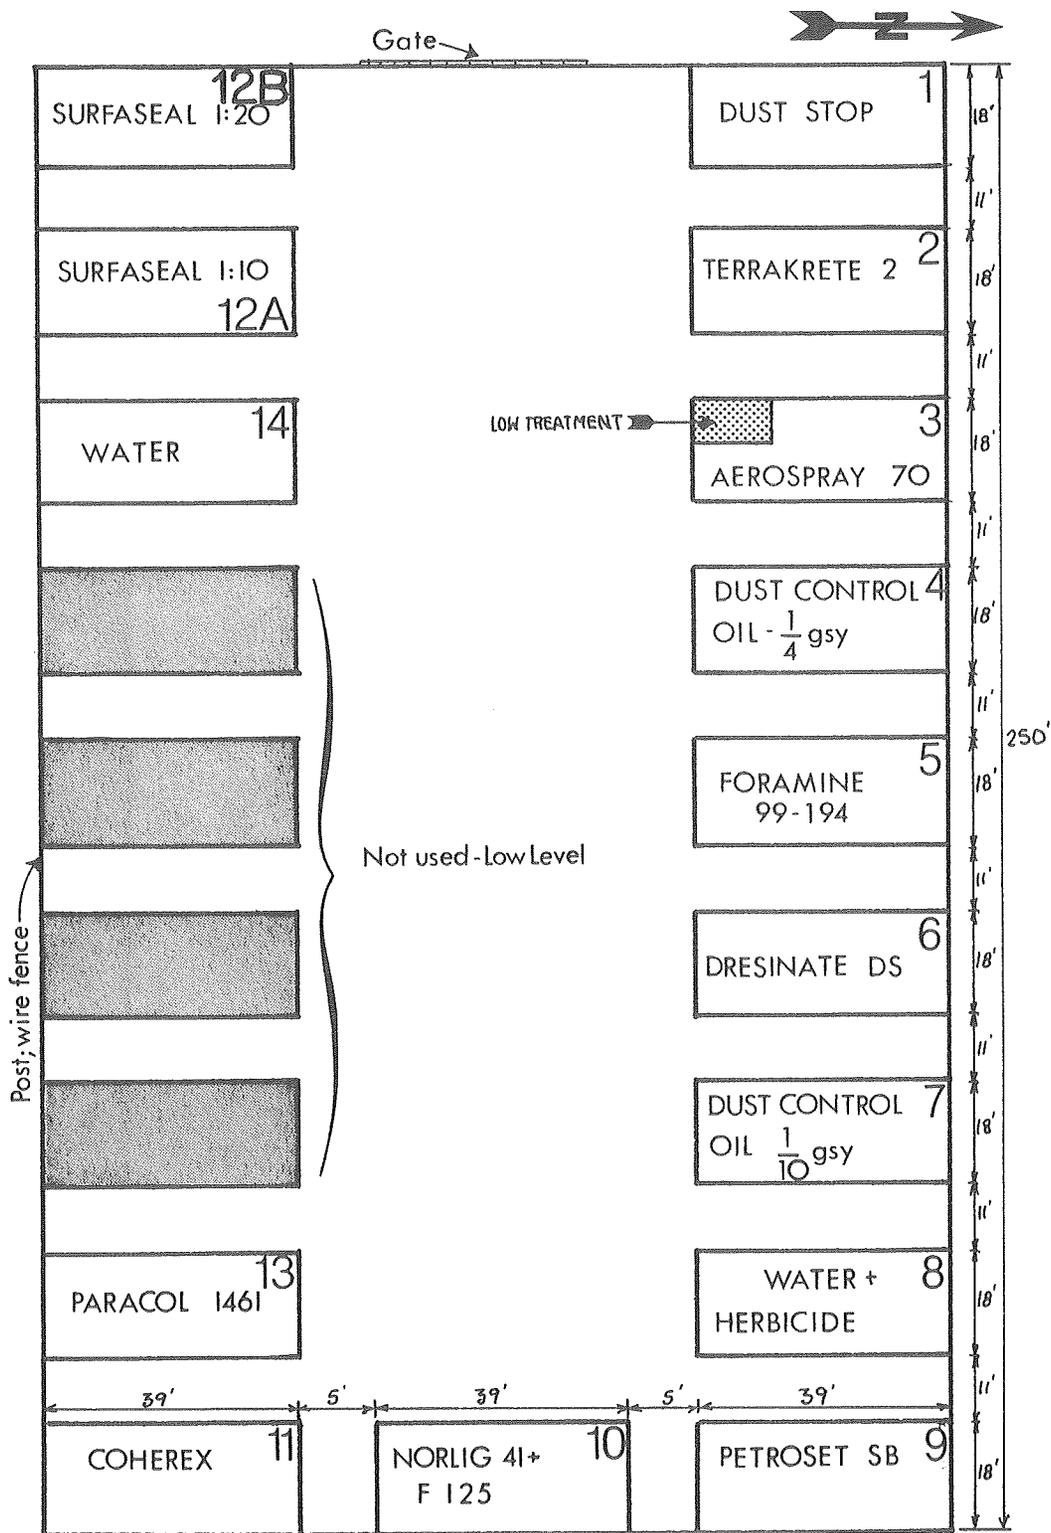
SITE PLAN, ADOT YARD-SITE
